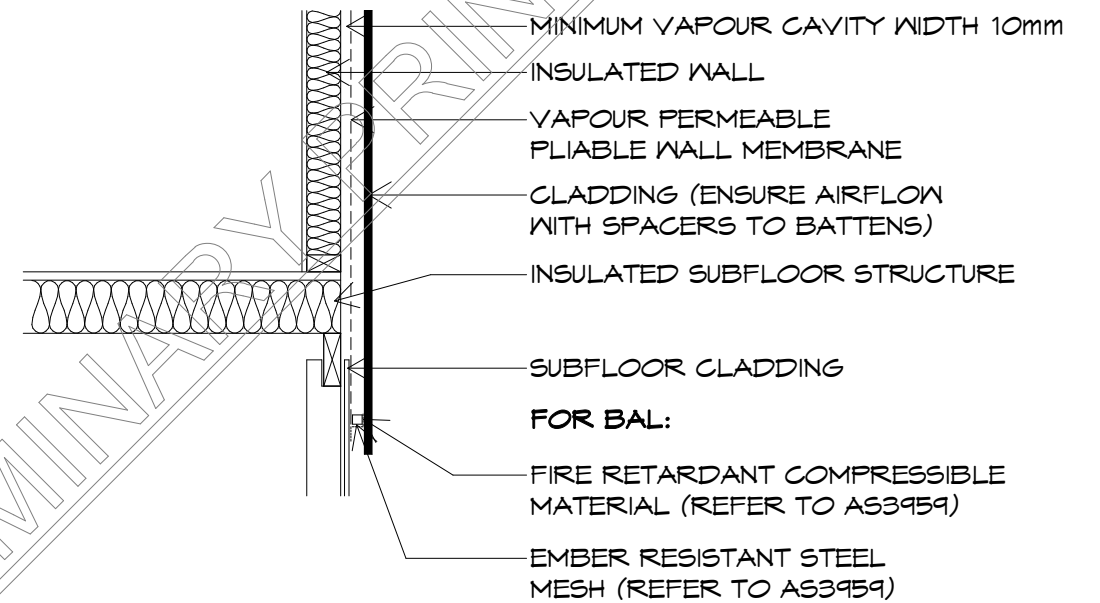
SUSPENDED TIMBER FLOOR WITH VERTICAL BATTENS
